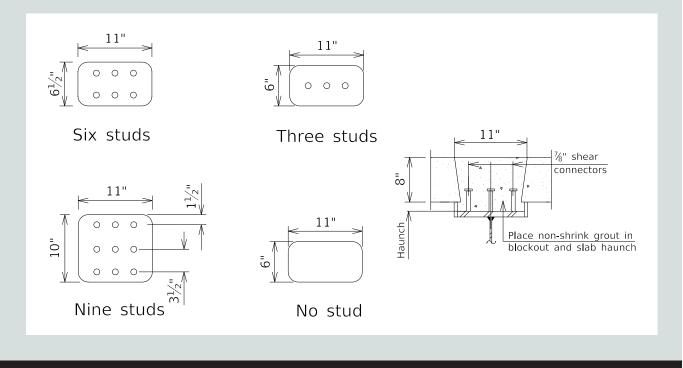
Cross sections showing shear stud configurations. Note: 1" = 1 in. = 25.4 mm.
